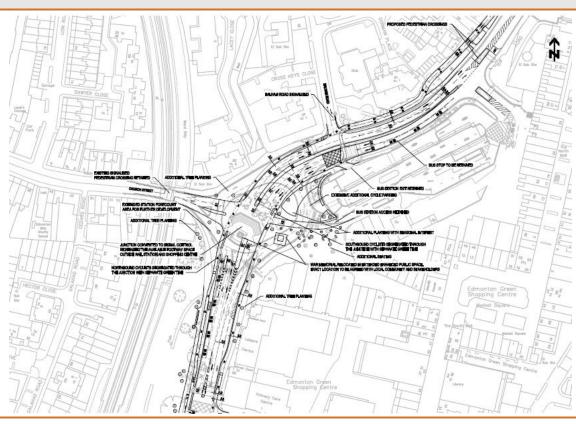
Proposed Plans for Edmonton Green (Station/Roundabout) – Option 1
